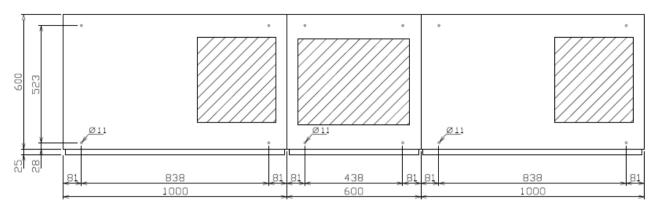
Detailed floor plan (with cable entry positions) for Power Xpert® CX switchgear
